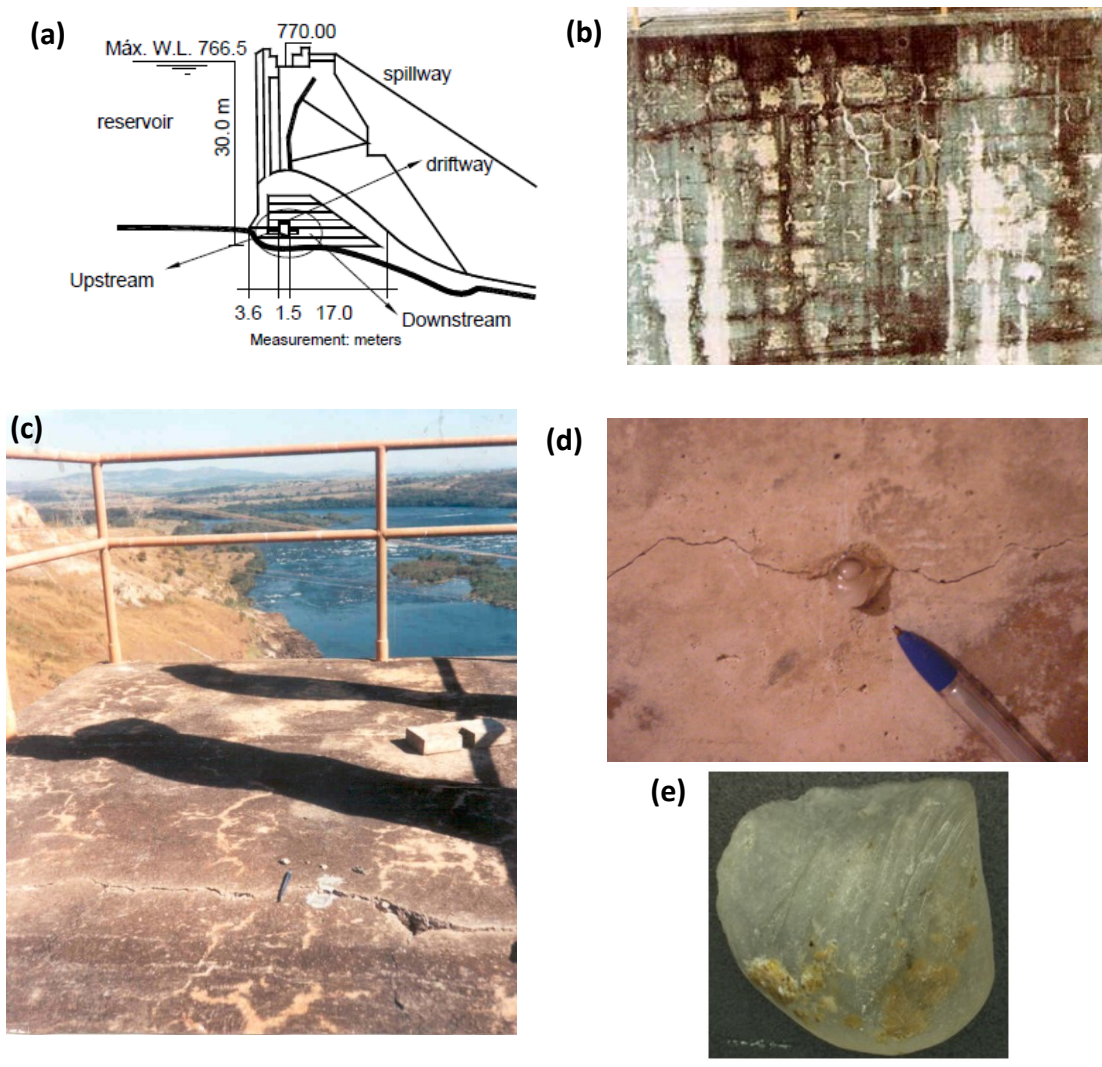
(a) Sketch showing a cross section of the spillway [191]. (b) Cracking caused by ASR in the spillway pillar [193]. (c) ASR gel extruding from cracks in the concrete surface of the spillway driftway [191]. (d) Crack along transversal section of a spillway column [191]. (e) ASR gel collected from the dam.
